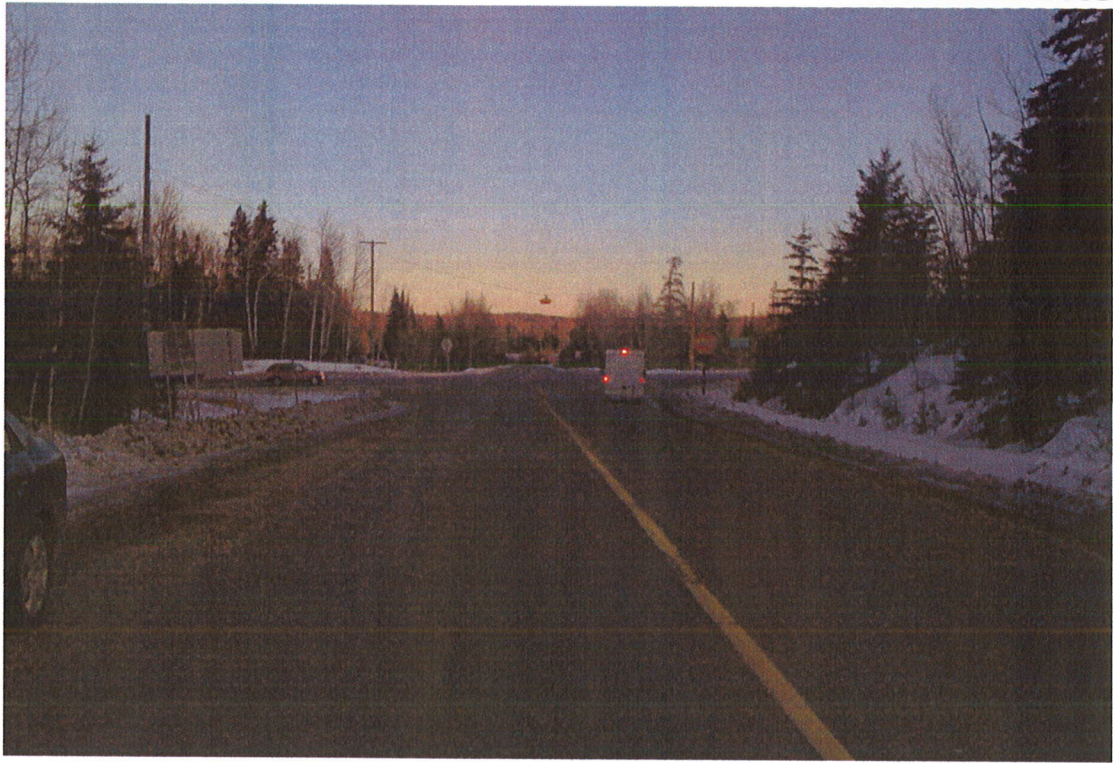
Looking North on Hodder Avenue towards Hwy 11/17 intersection
